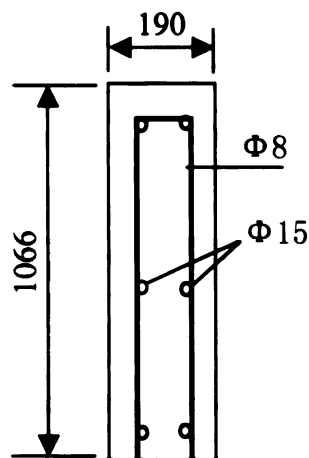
Geometry of the concrete barrier and steel reinforcement
